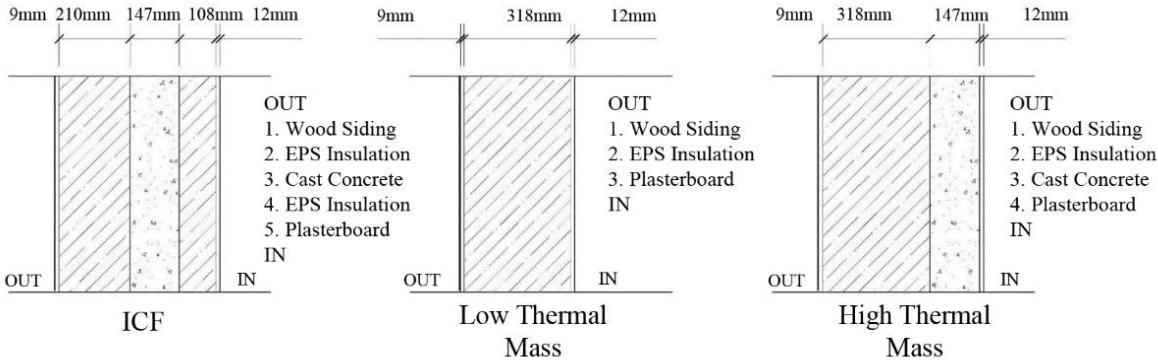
Cross-section of the three wall construction methods (ICF; LTM and HTM).
